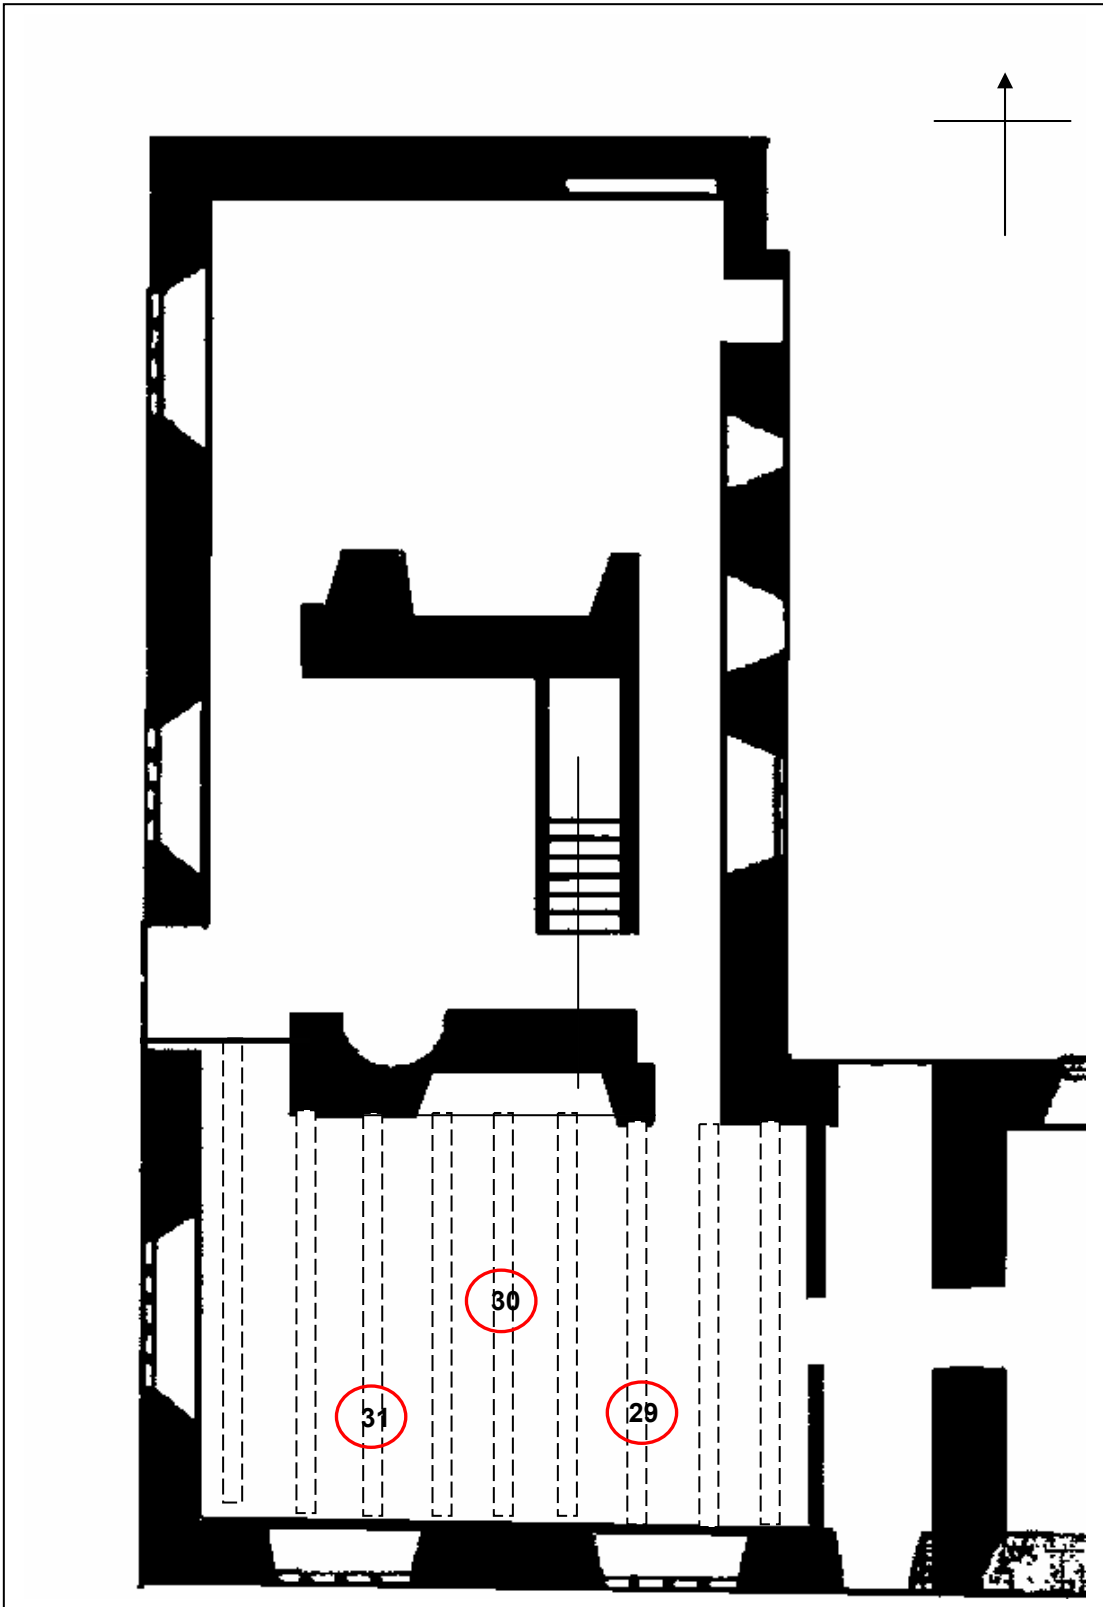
Pridhamsleigh manor; ground-floor rooms to show approximate location of sampled timbers
